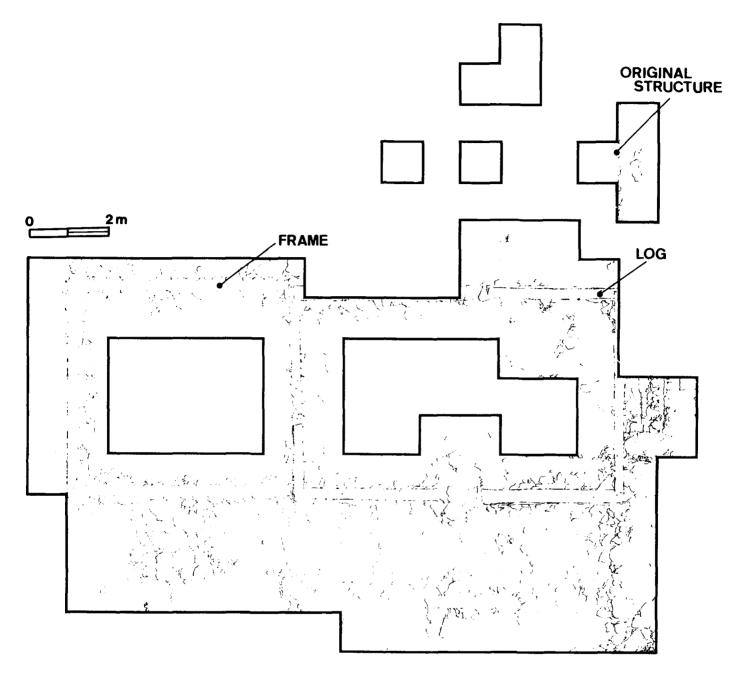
Plan of the Samuel H. Smith house excavation showing construction elements (from O'Brien 1984).
